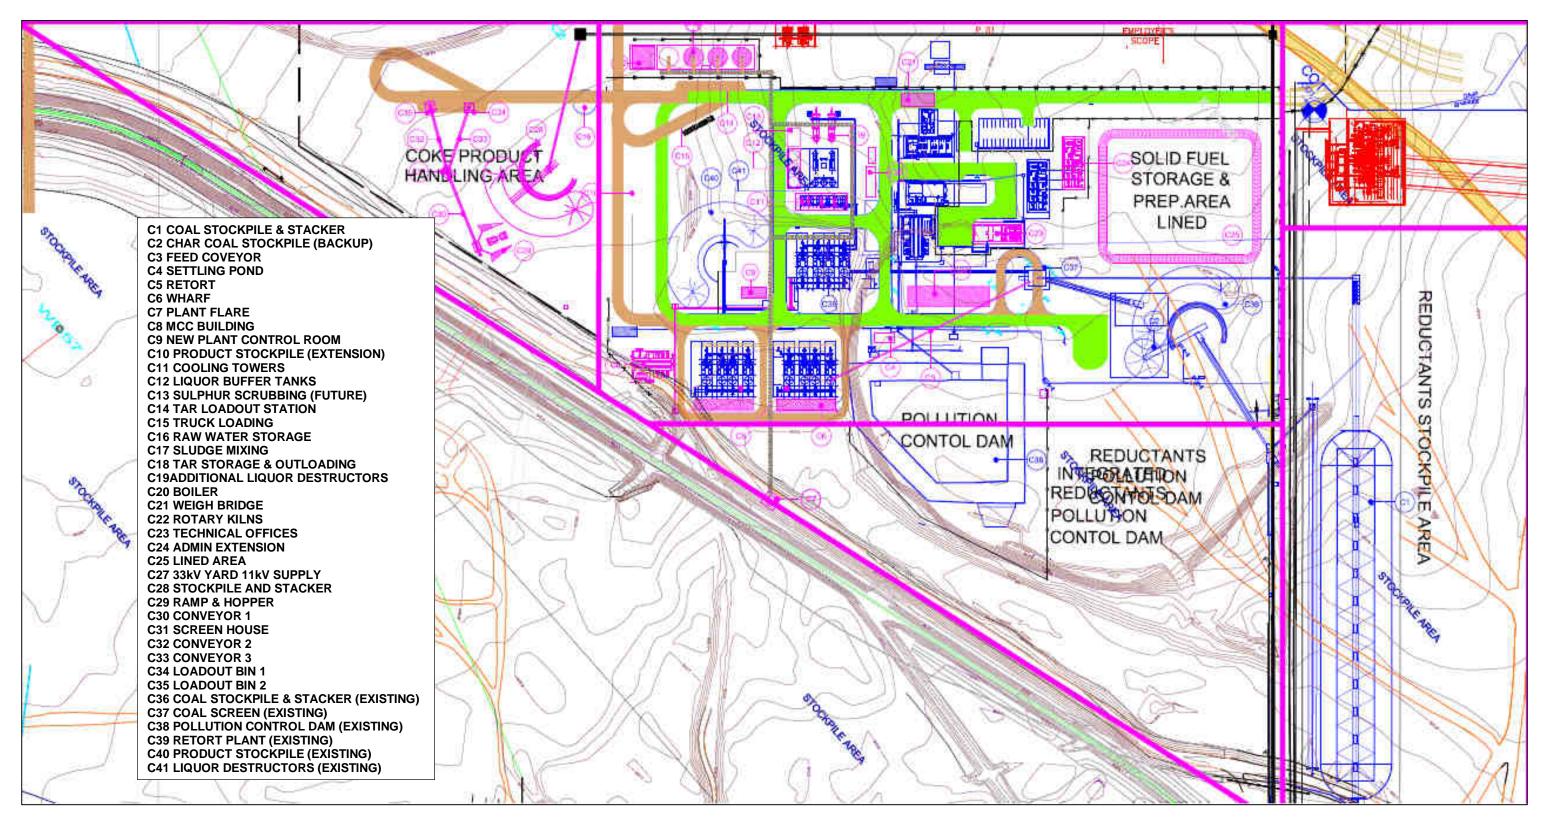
Smaller scale layout of Char Manufacturing Plant Expansion showing plant and stockpile areas
